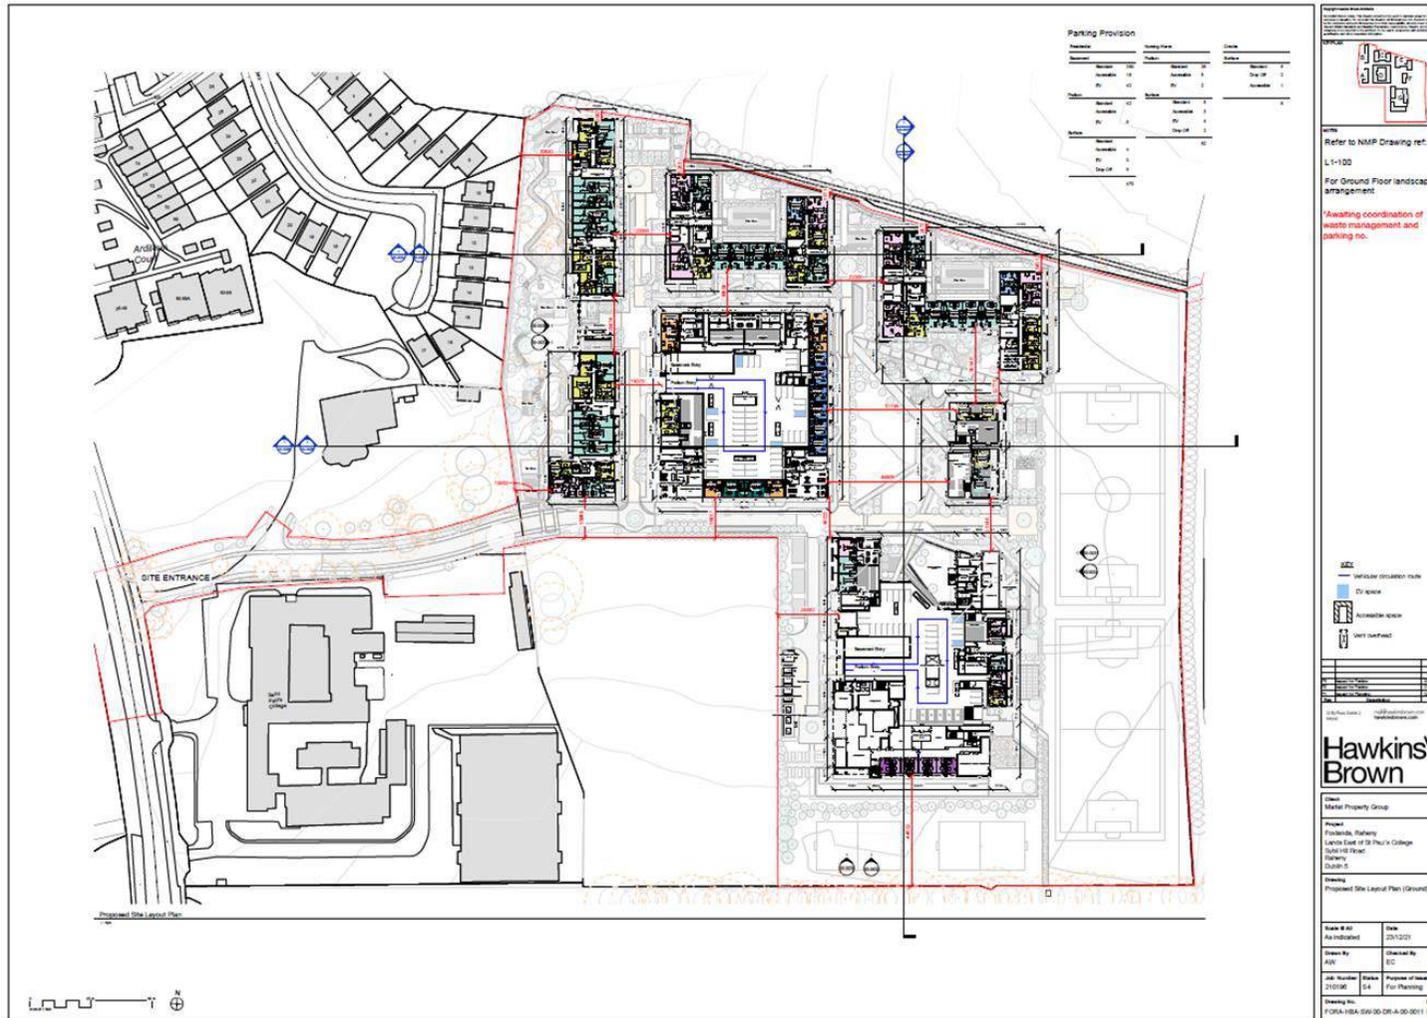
Proposed Development Layout (Ground Floor) (Hawkins Brown Drawing no. FORA-HBA-SW-00-DR-A-00-0011)
